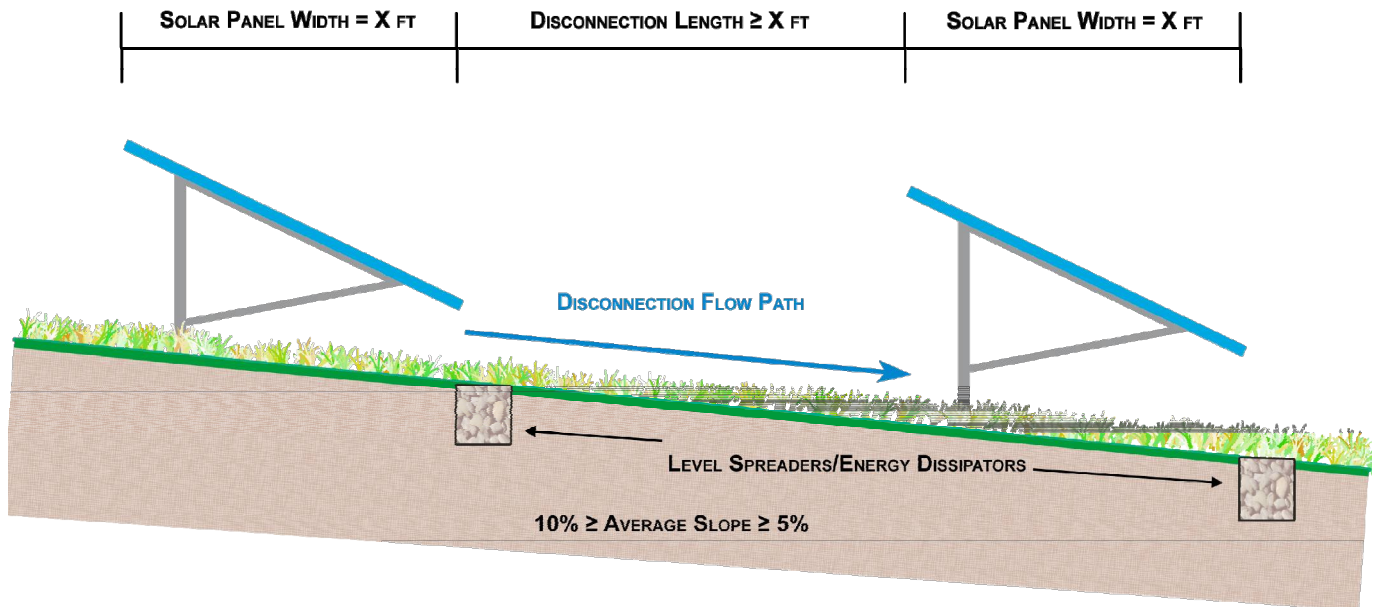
Typical Installation – Slope $\geq 5\%$ but $\leq 10\%$
